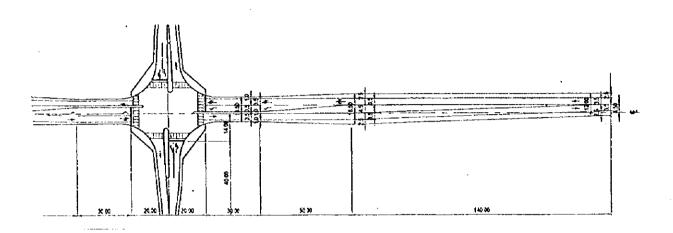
TYPICAL LAYOUT OF INTERSECTION (Phase-1)
